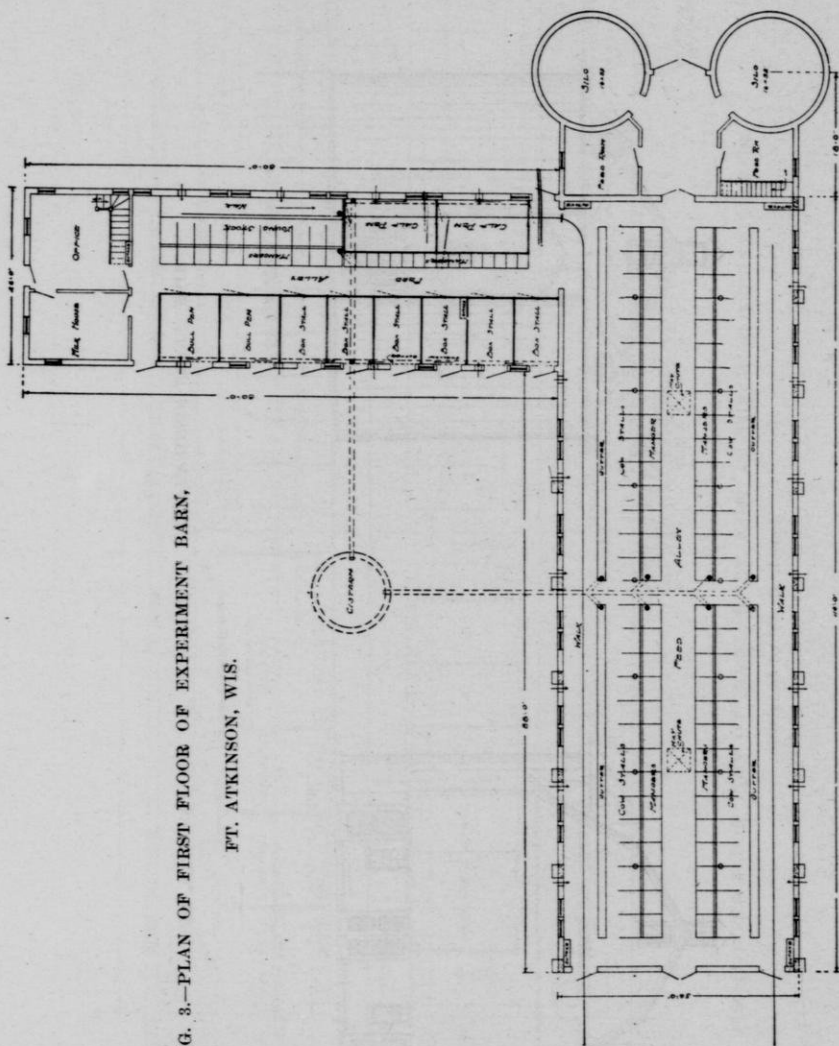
PLAN OF FIRST FLOOR OF EXPERIMENT BARN,
